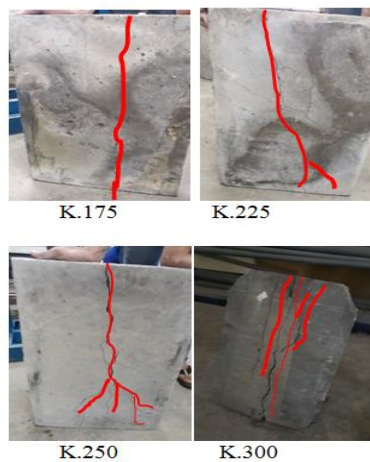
The cracking behavior of concrete slabs with a thickness of 3.5 cm
